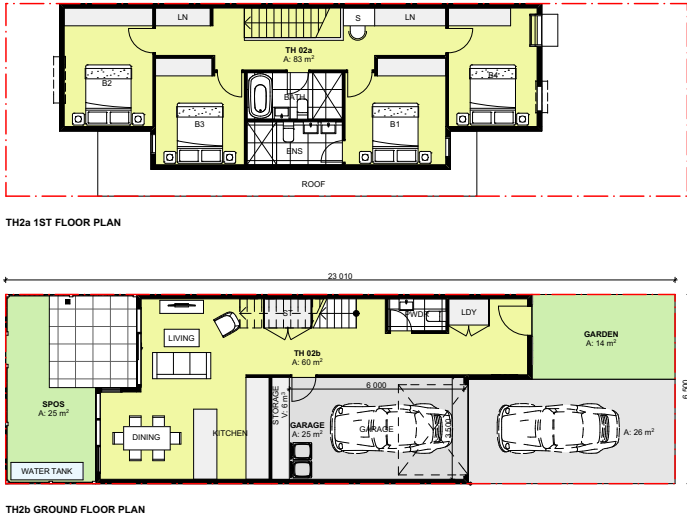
Townhouse Type 02a (Source: Plus Architecture)
